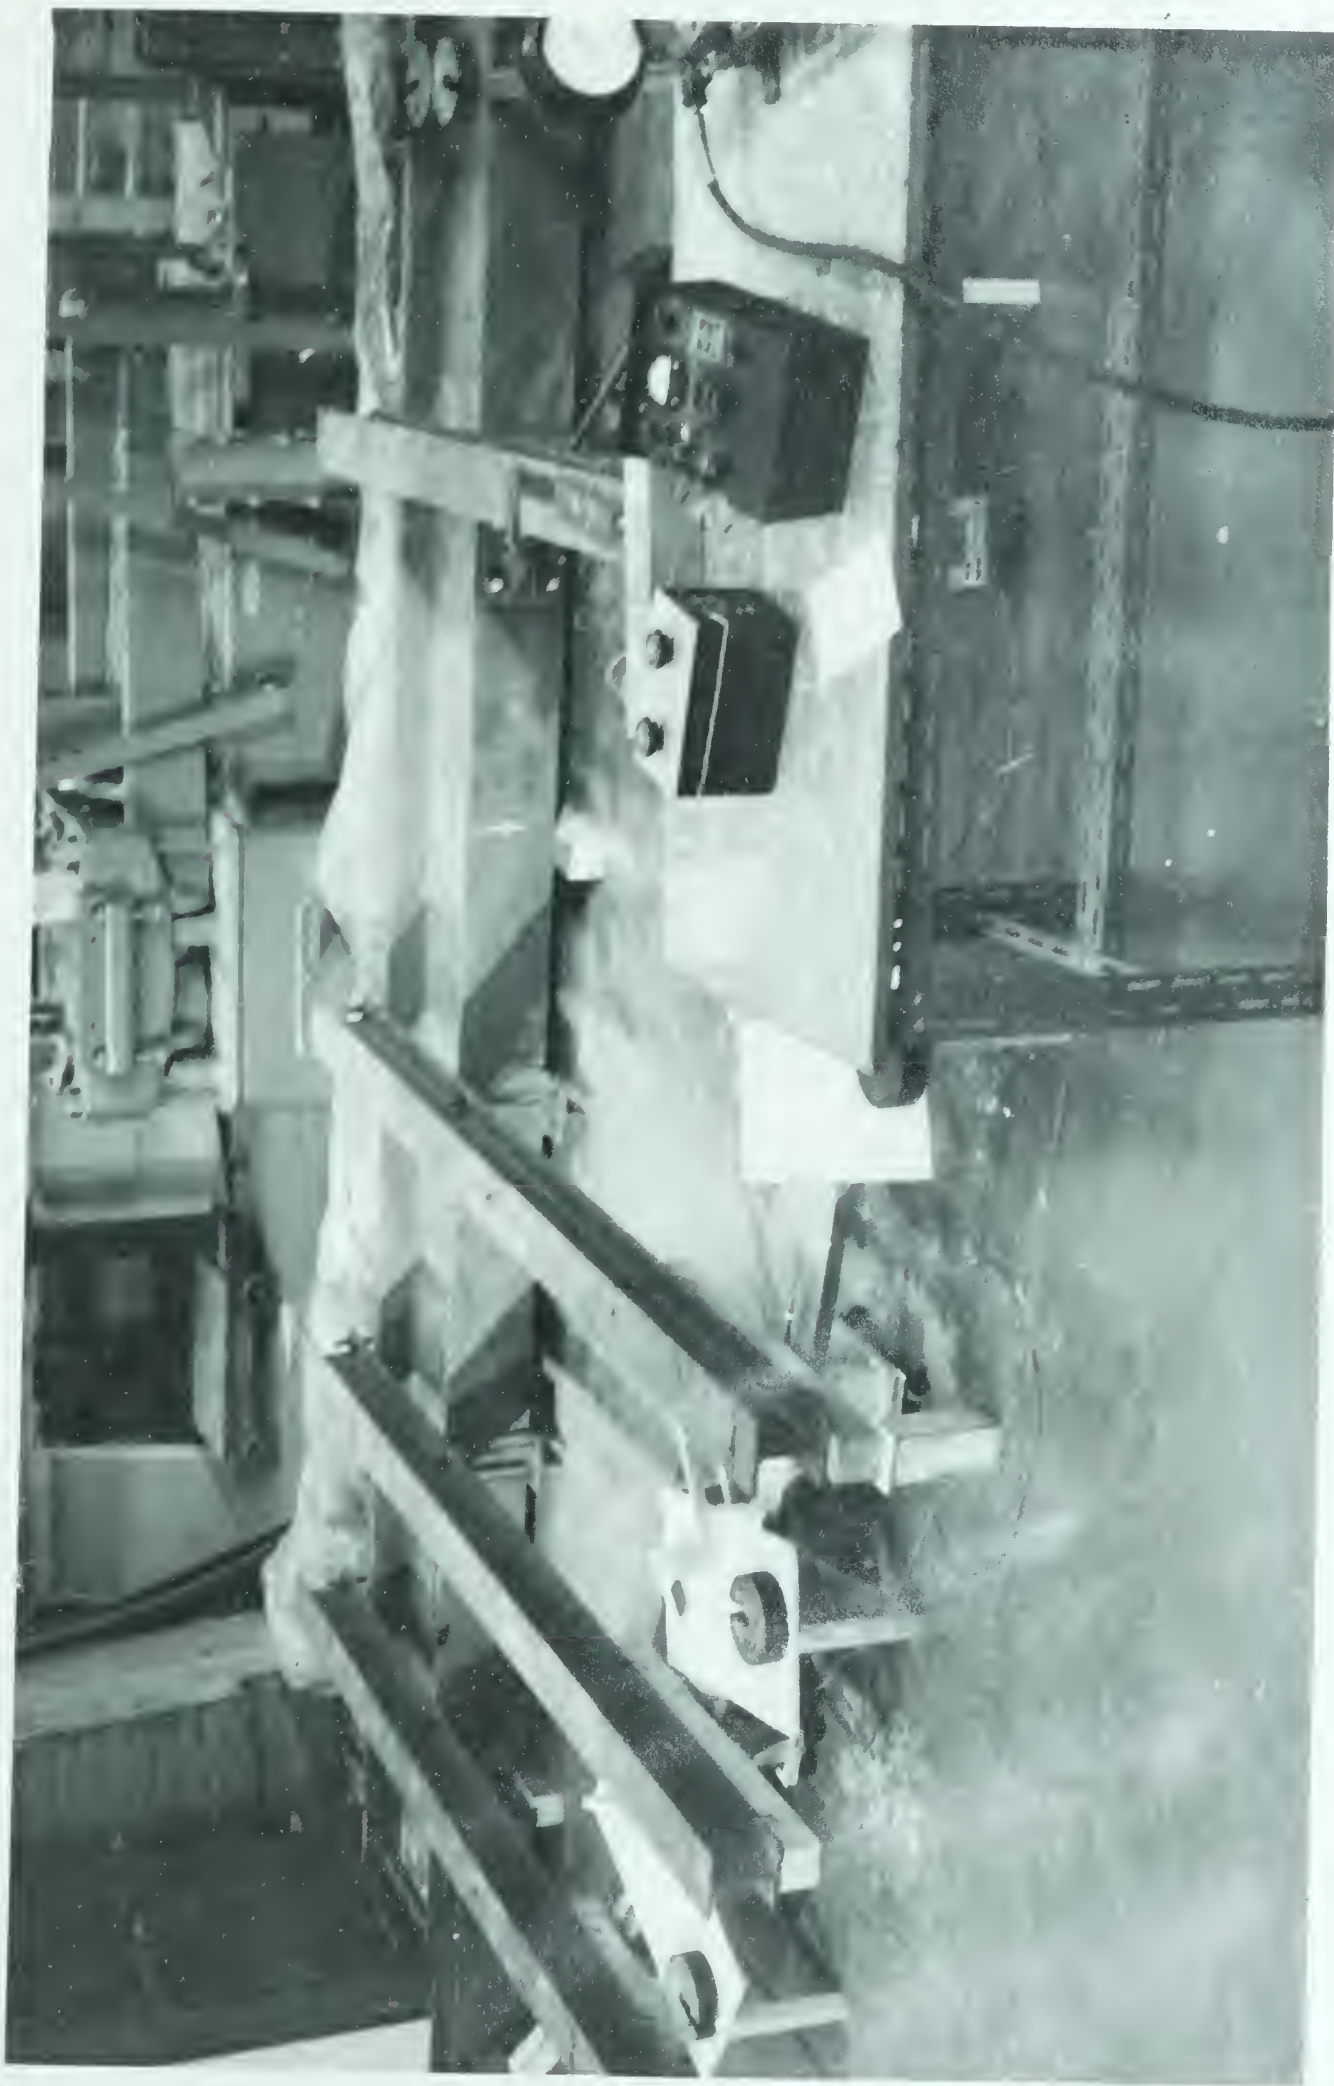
View of Arch Testing Apparatus - Hinge End.
